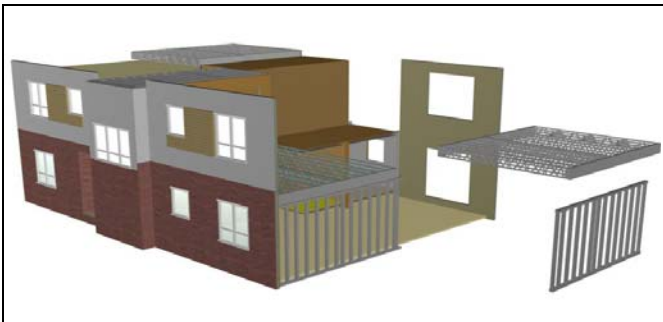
'Hybrid' modular and panel building showing planar floors and walls attached to the modules
